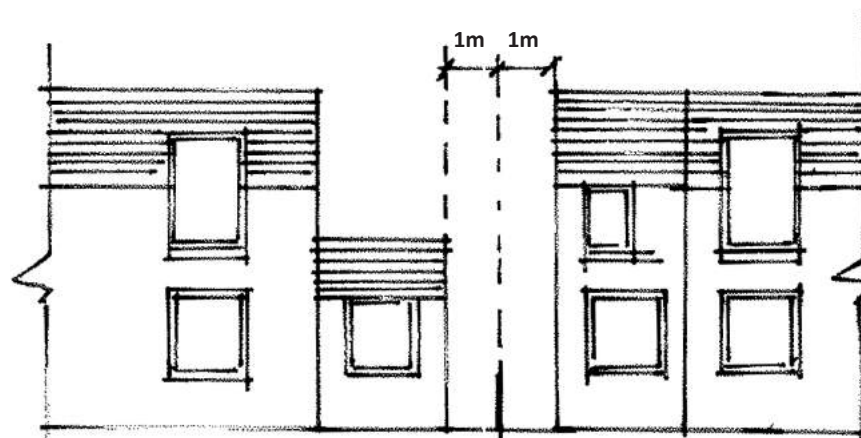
A minimum of 1 metre must normally be retained between the new side wall of the extension and the boundary of the site to prevent a terracing effect
